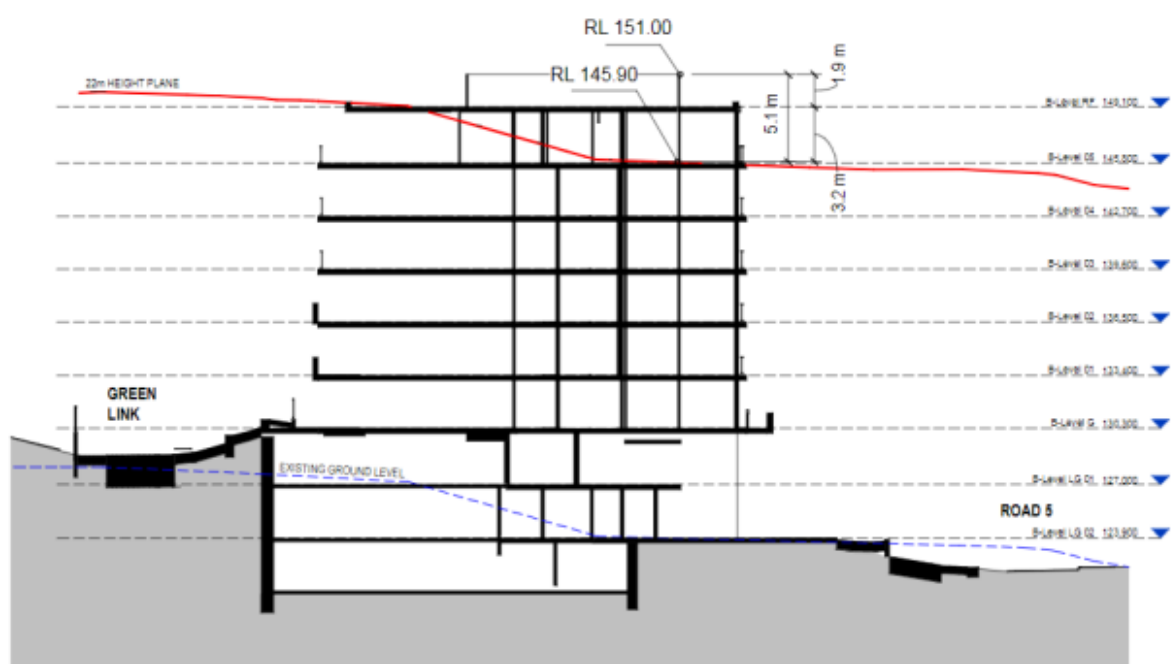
South Section of Building B showing the extent of height contravention (5.1m) (Source: Mirvac Design)
